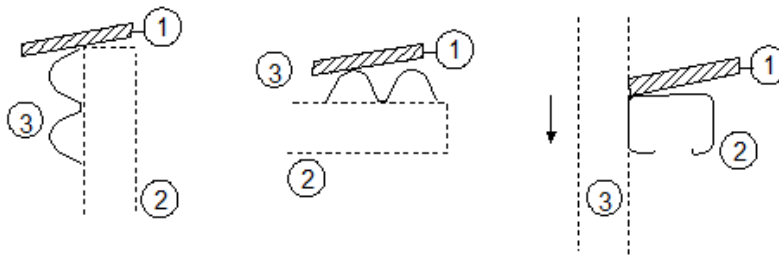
drop test configuration: 1-impacting blade; 2-barrier's post; 3-barrier's rail
